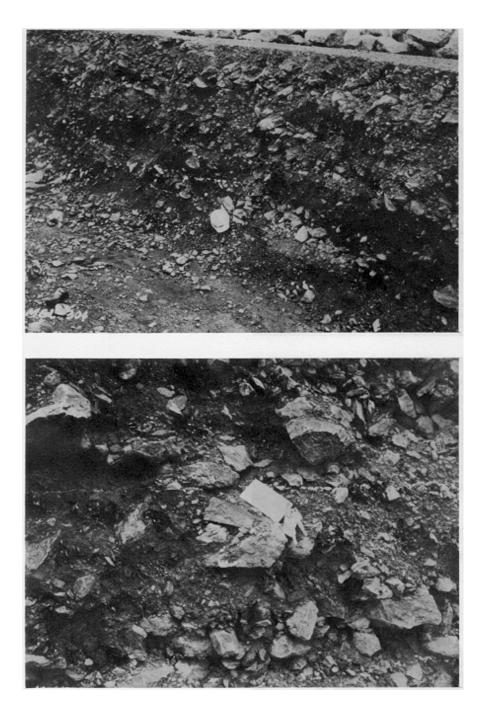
Photographs of rockfill containing appreciable fines, New Melones Dam test fill inspection trench
